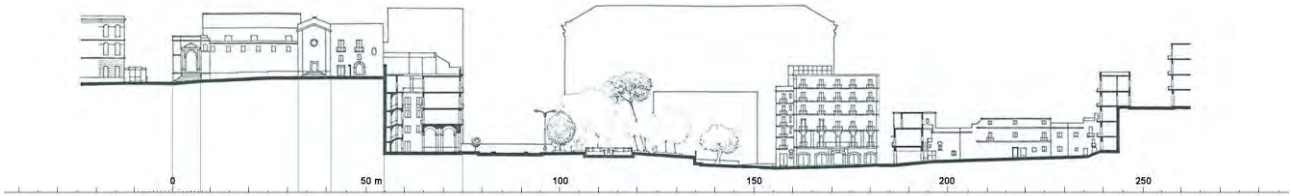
Road transversal section of difference in level (about 17 m); from piazzetta S. Andrea delle Dame to salita Stella.
